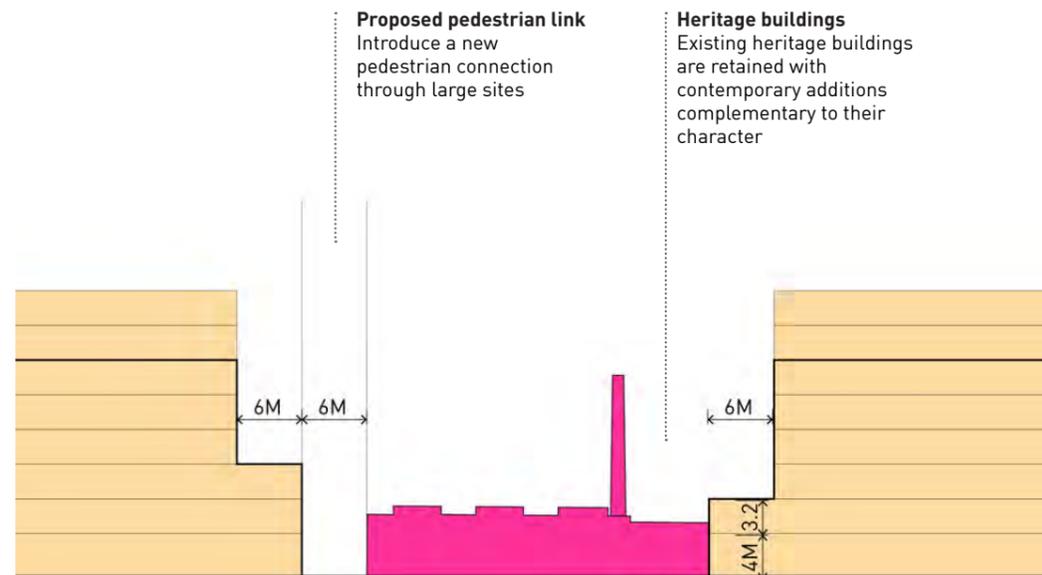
Proposed built form envelopes (elevation) in response to existing heritage building
